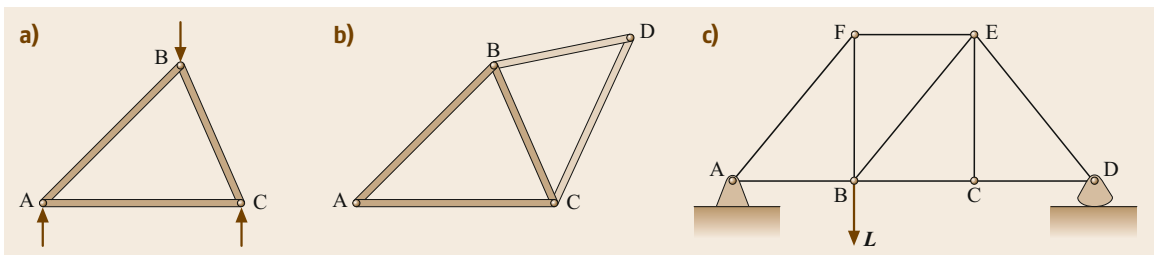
c Truss structures. (a) A basic truss element showing forces applied at the joints. (b) A five element truss. (c) A truss bridge with supports and an applied load
